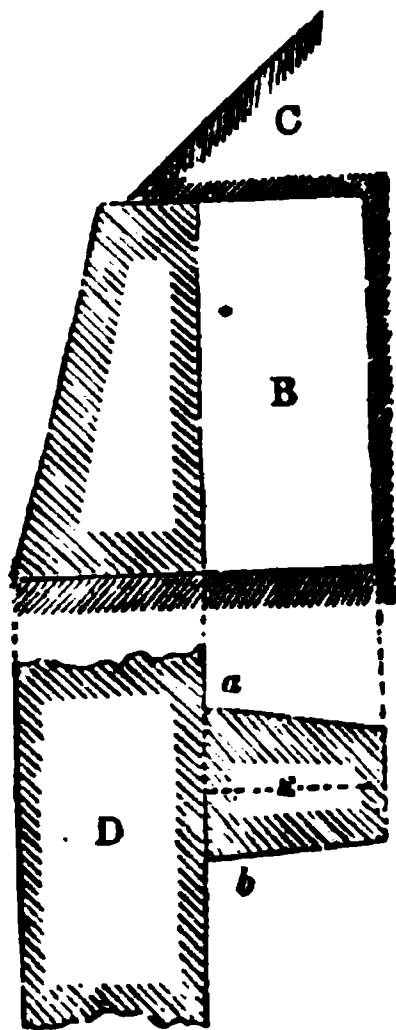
Represents a section A and plan D of a wall, and a elevation B, and plan E of a trapezoidal counterfort.
